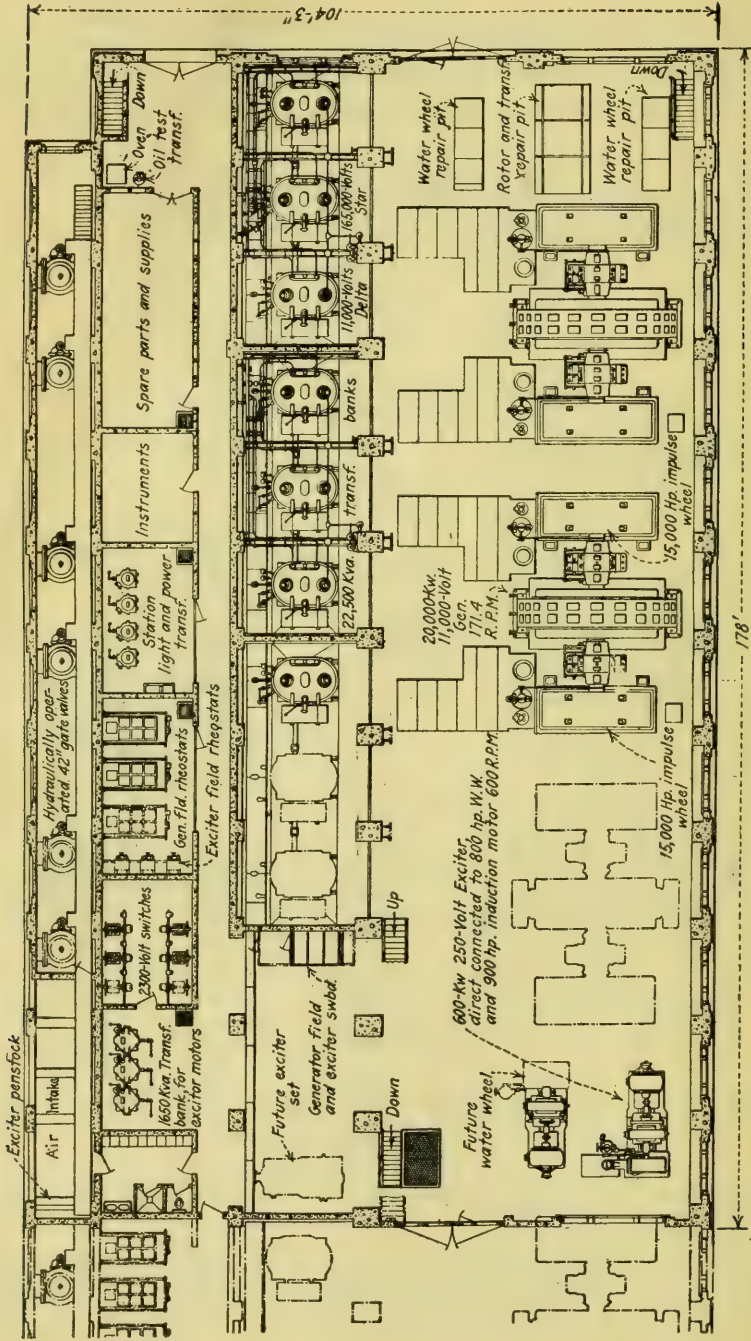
A.—Main Floor Plan, Caribou Power Station, Great Western Power Company. (For Cross-section, see Fig. 103.)
